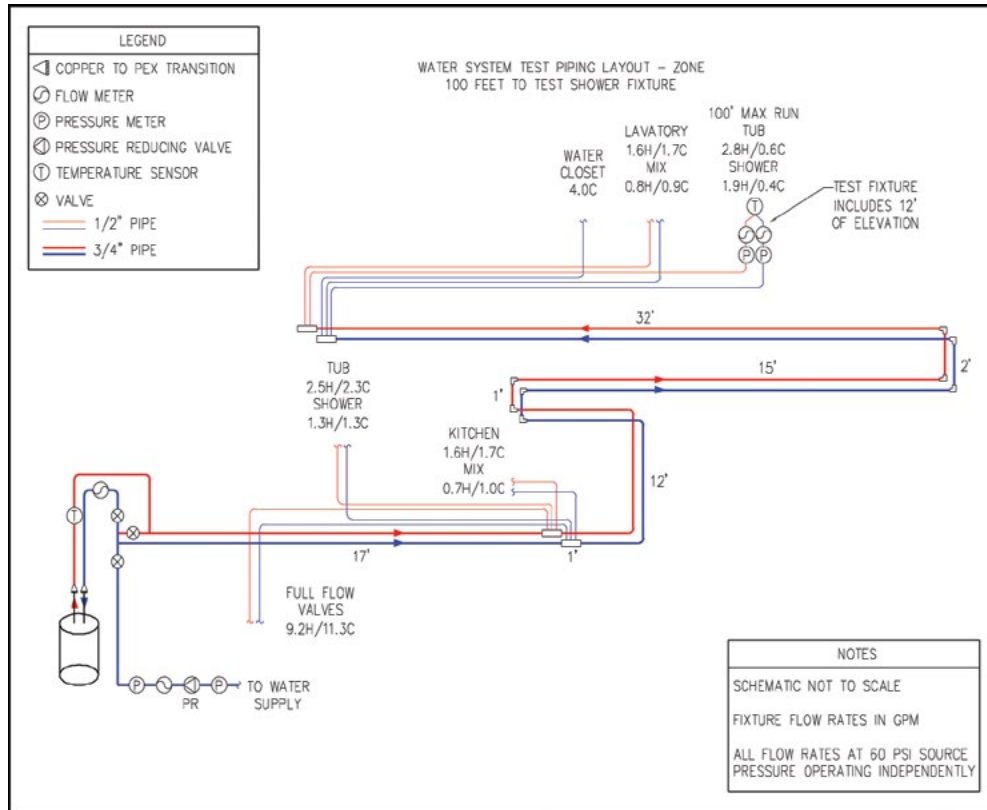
Water System Test Piping Layout – Zone, 100' to TF
